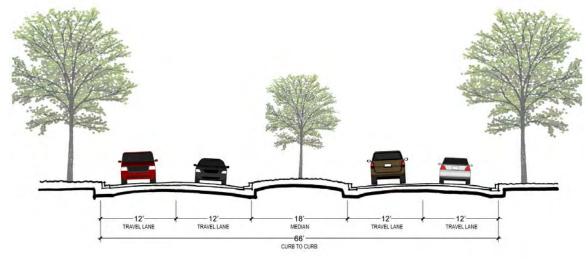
Proposed four-lane, median divided cross section for Marietta Road/Highway 174
